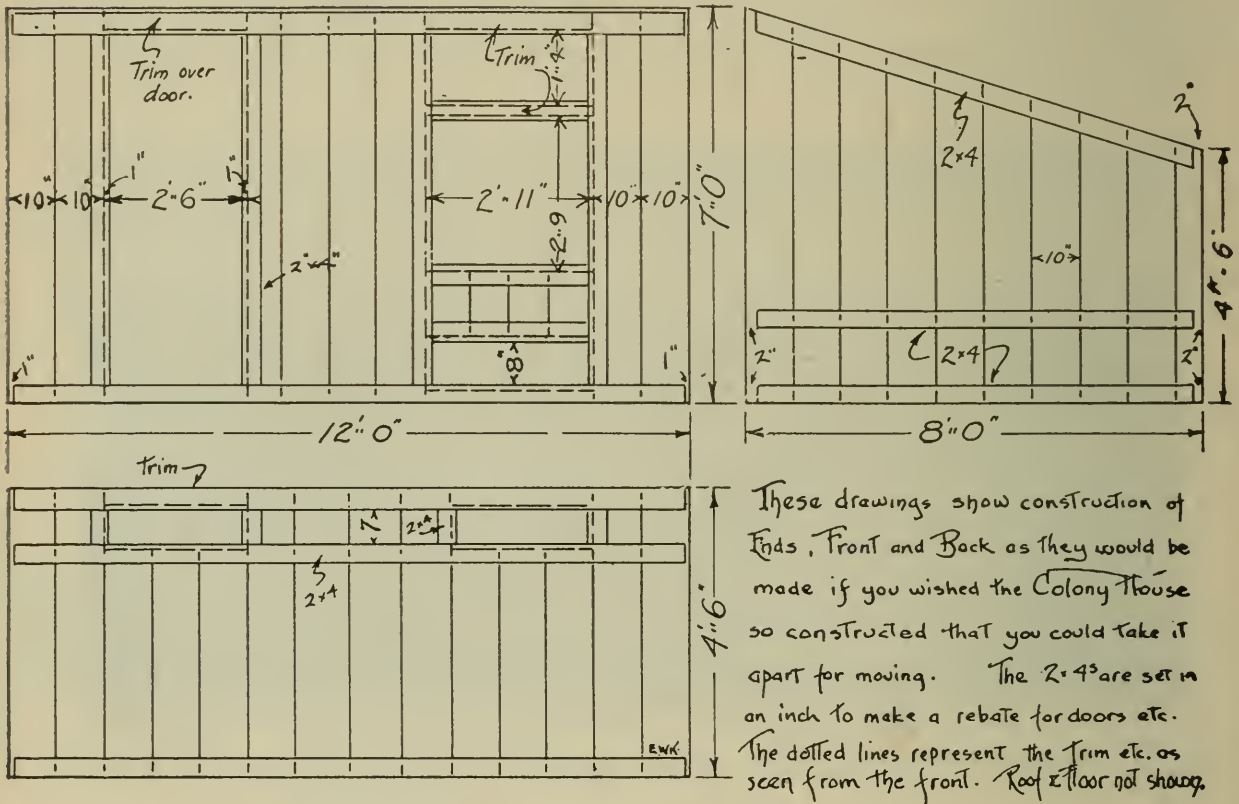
Plans showing front, end and rear wall construction where desired to have the house of the take down type.
